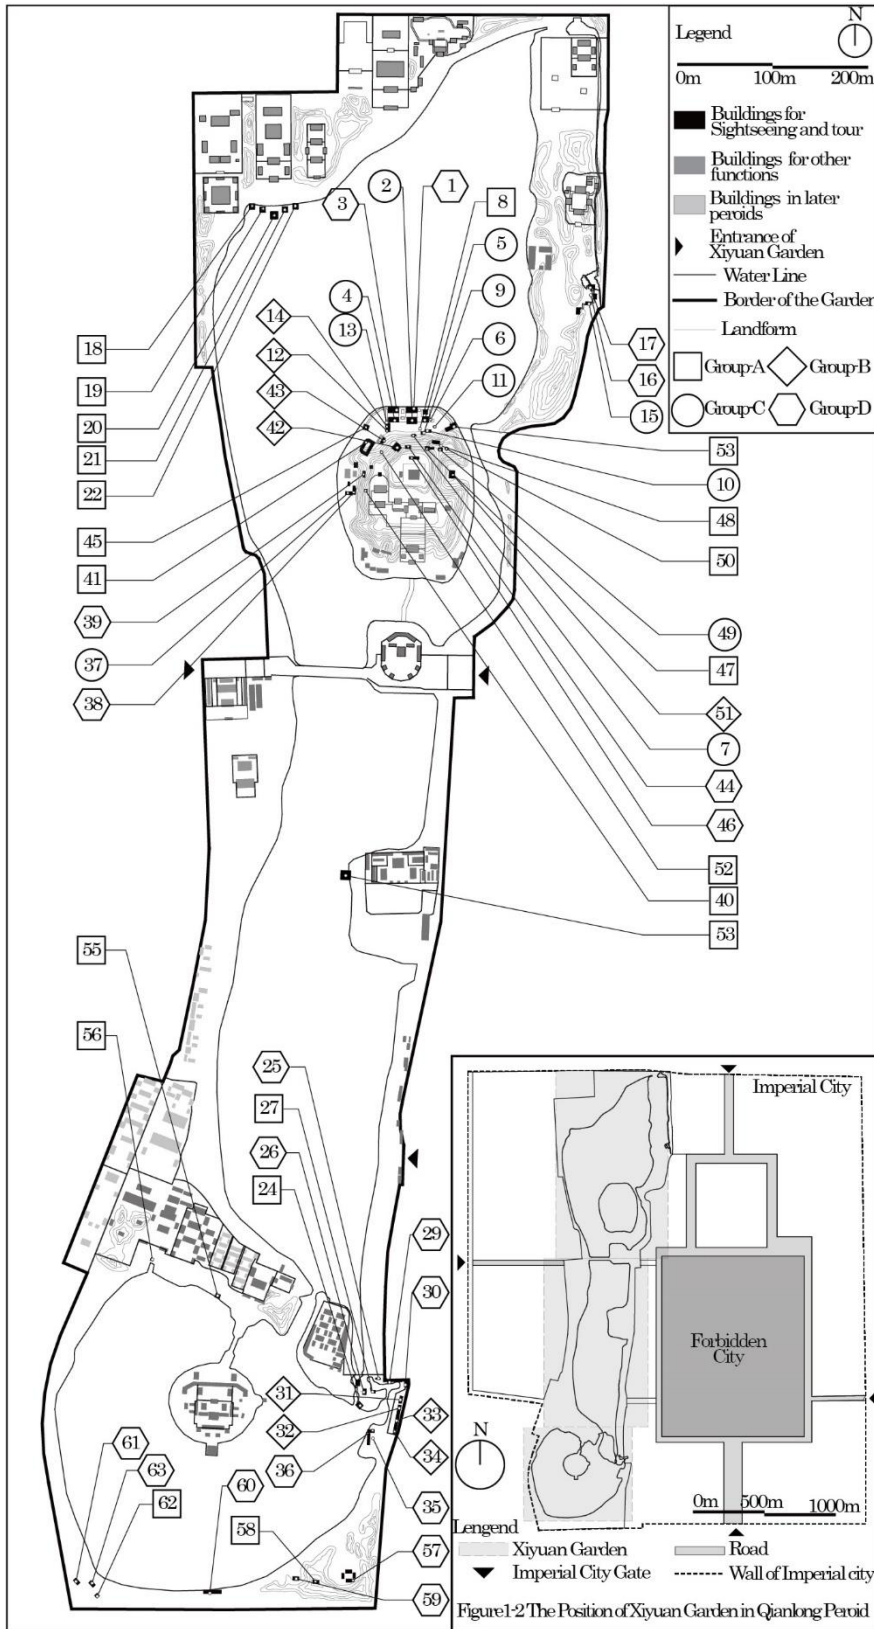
Master Plan and Location of Buildings of Xiyuan Garden
